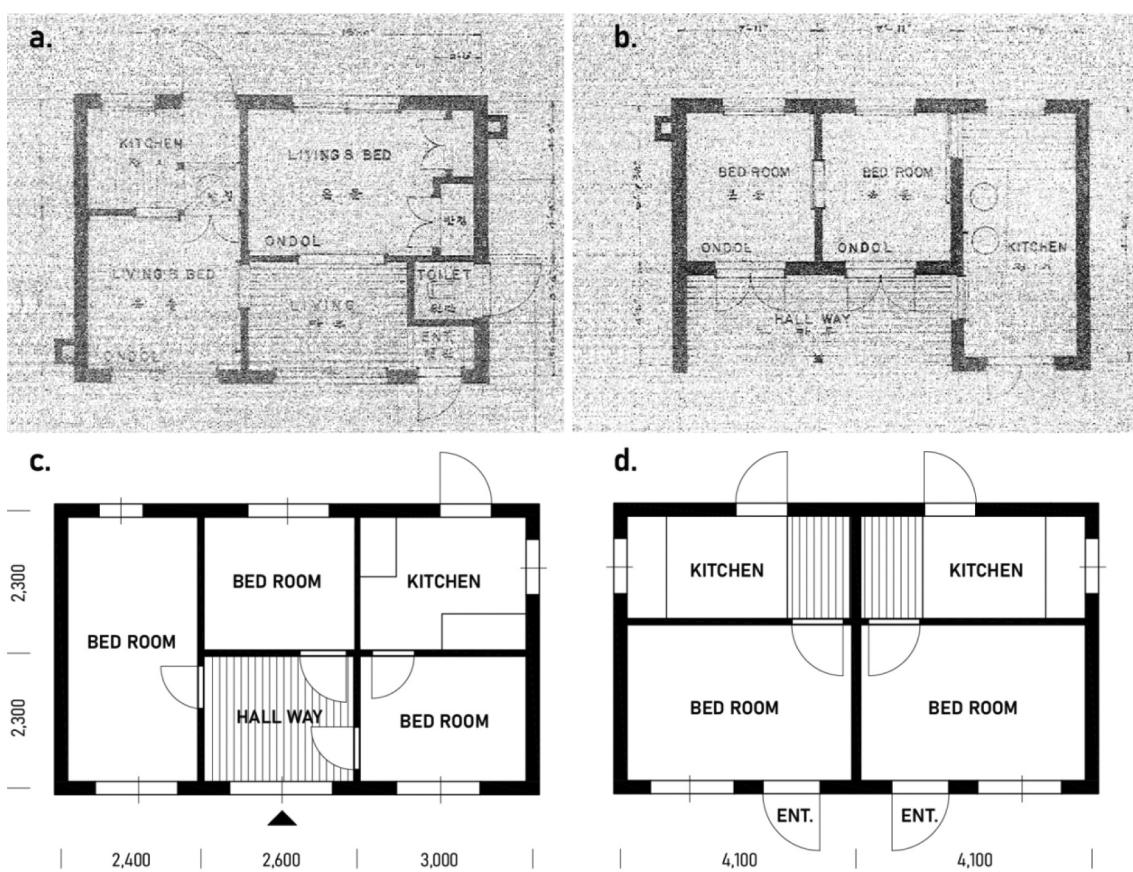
Floor plans of National Housing: (a) standard urban-type plan, applied in Jeongneung-dong; (b) standard rural-type plan; (c) plan applied to detached houses in Pyeonghwa-dong; (d) plan applied to semi-detached houses in Pyeonghwa-dong. Source: (a), (b) UN archives; (c), (d) Authors' drawing based on field measurements and interviews.
